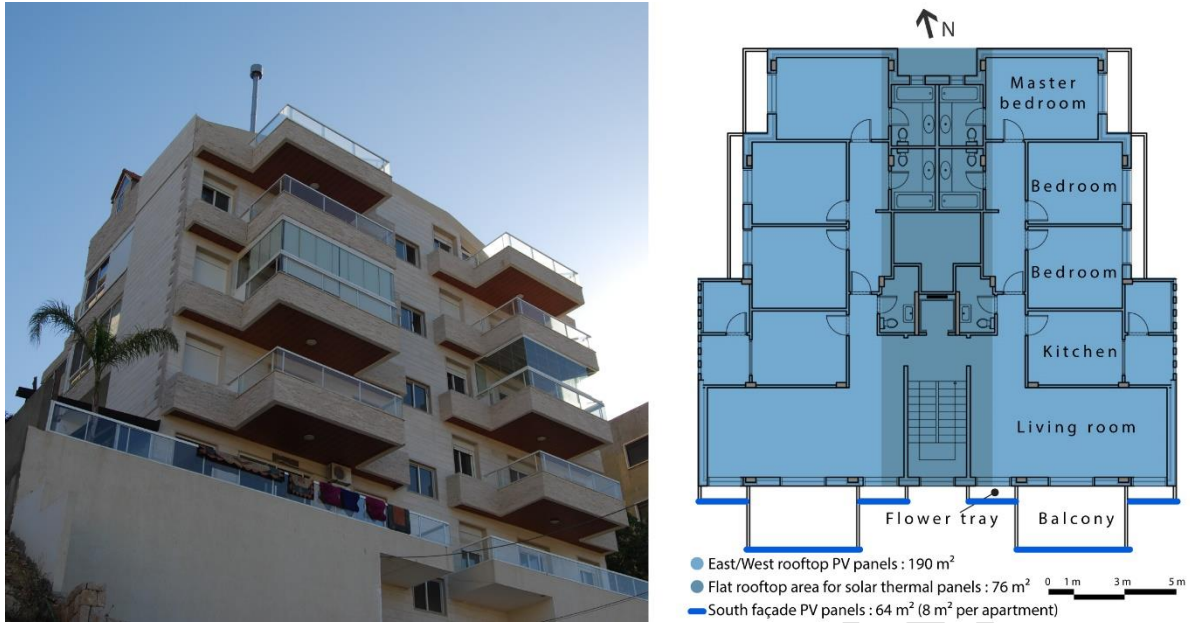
South elevation and floor plan of case study apartment building in Sehaileh, Lebanon. Note: PV = photovoltaic. Areas and floor plan based on Technical Enterprises Co. [32].
